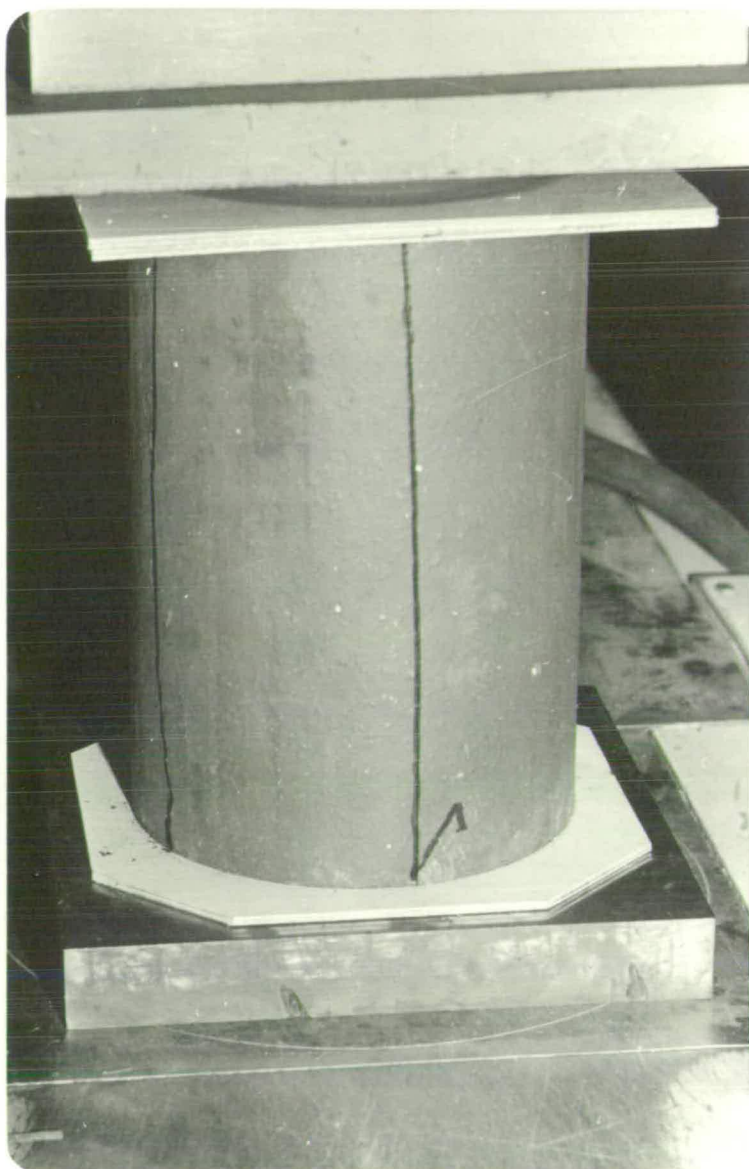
TYPICAL CRACK FORMATION IN CLAY PIPE
